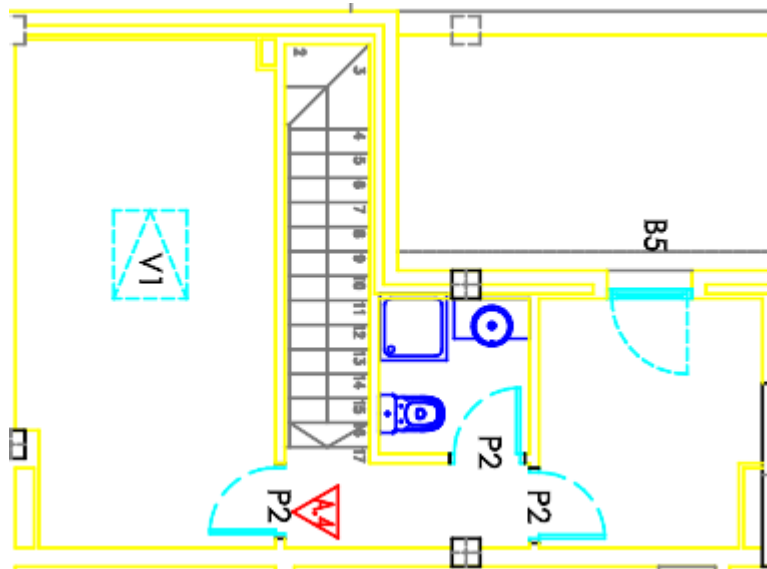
FLOOR PLAN OF THE TOP FLOOR OF APARTMENT 3 MENTIONED IN TABLE 2.20
